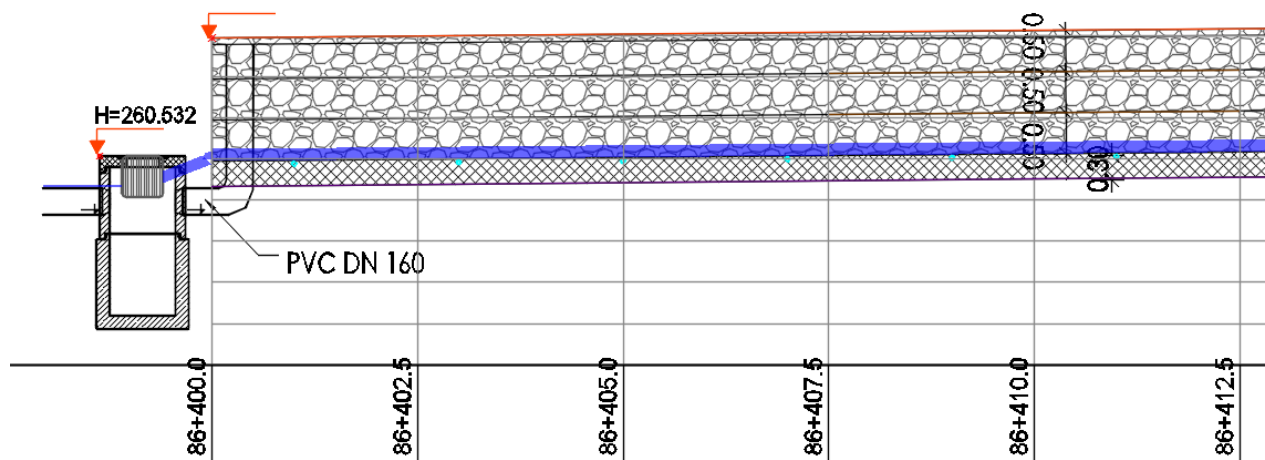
DETAIL OF THE LONGITUDINAL PROFILE OF THE RETAINING WALL STRUCTURE
